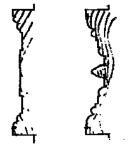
Section profiles at pilaster: upper portion (left) and lower portion (right).
